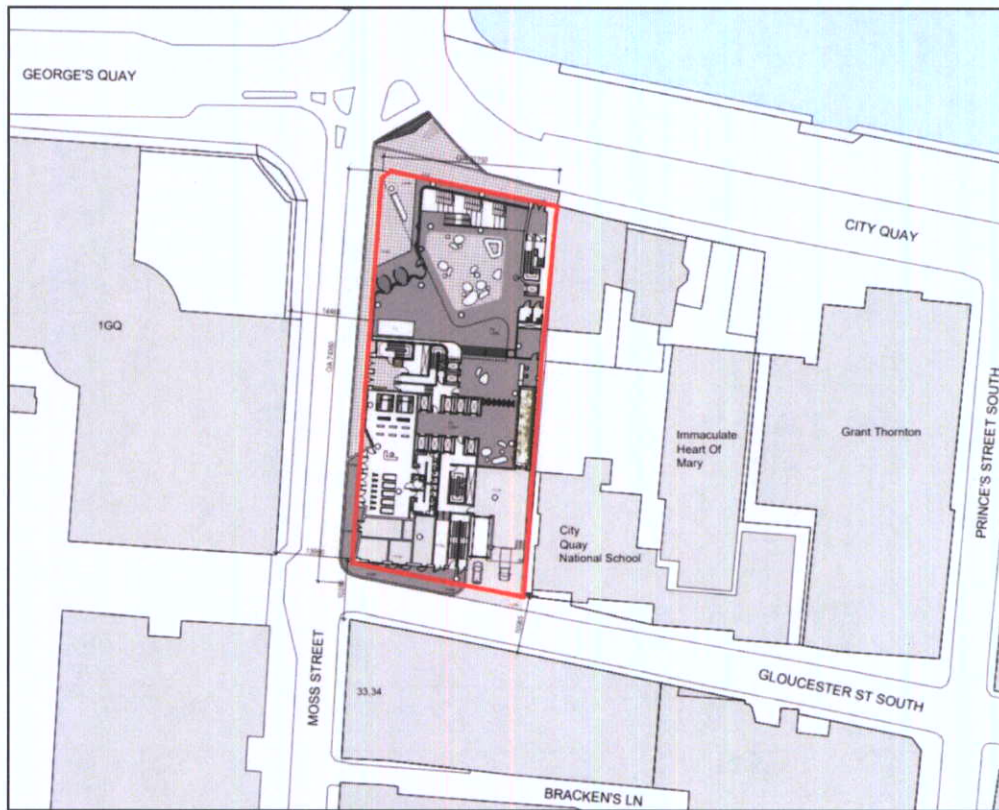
Proposed Site Layout (Mahoney Architecture 2022)
